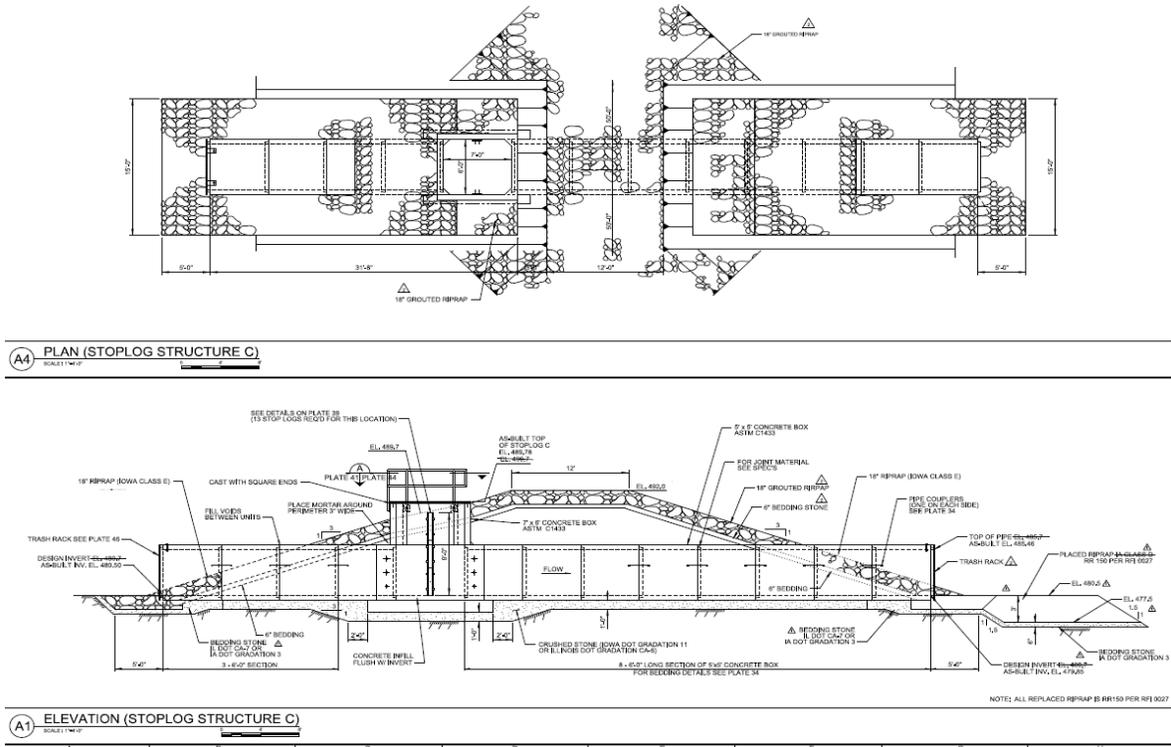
Sample drawing of reinforced concrete box culvert with reinforced concrete box stop log riser
